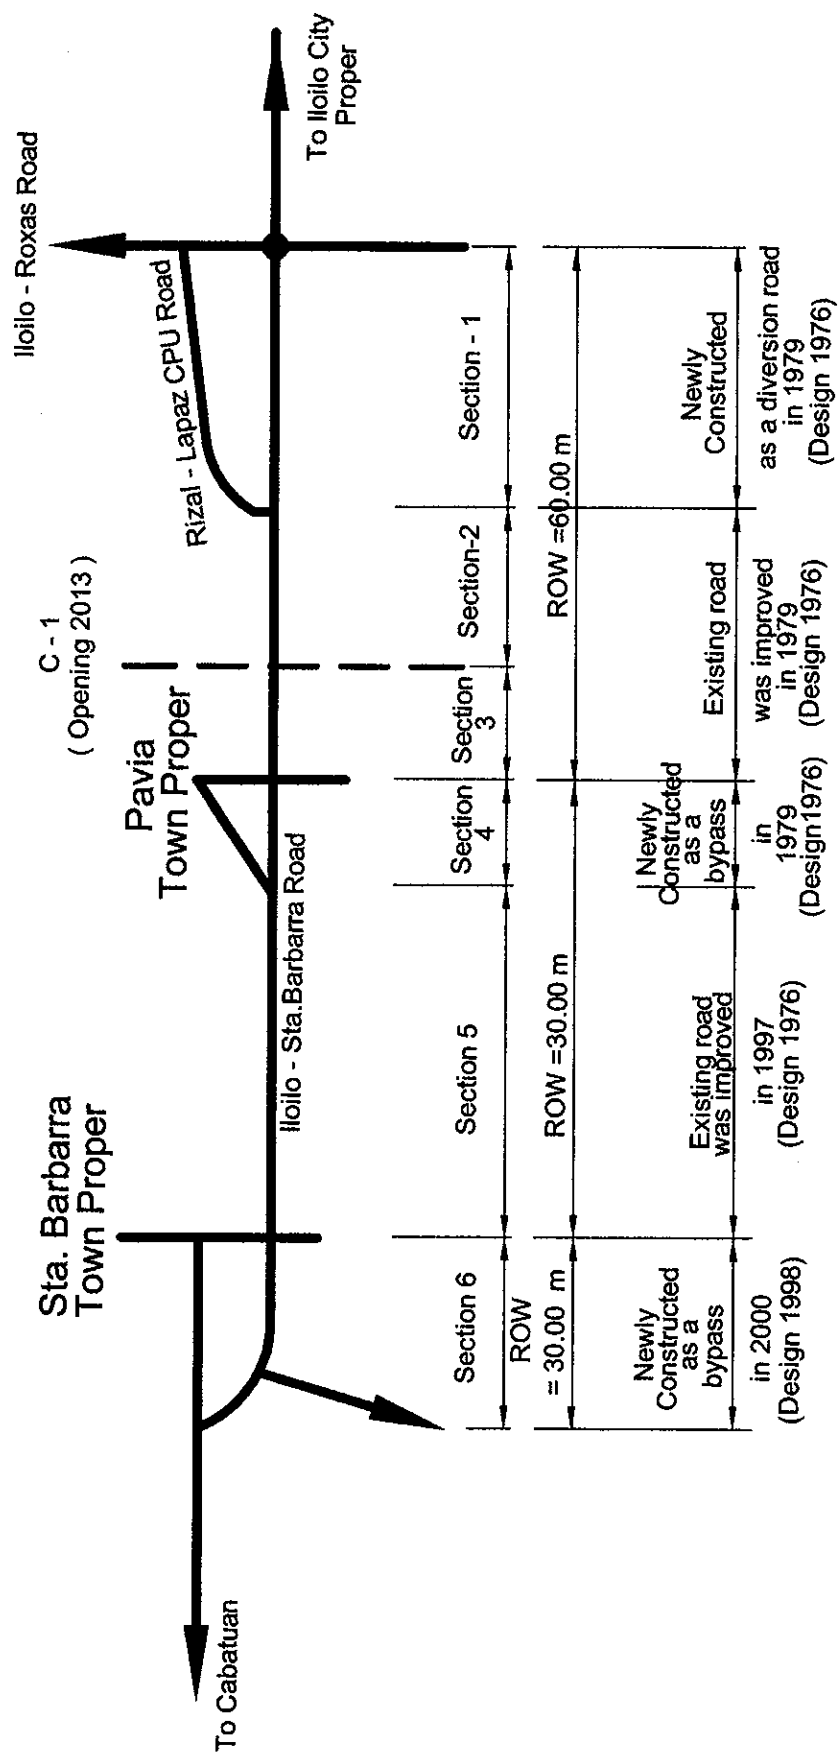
1 HISTORY OF ROAD CONSTRUCTION AND ROW
